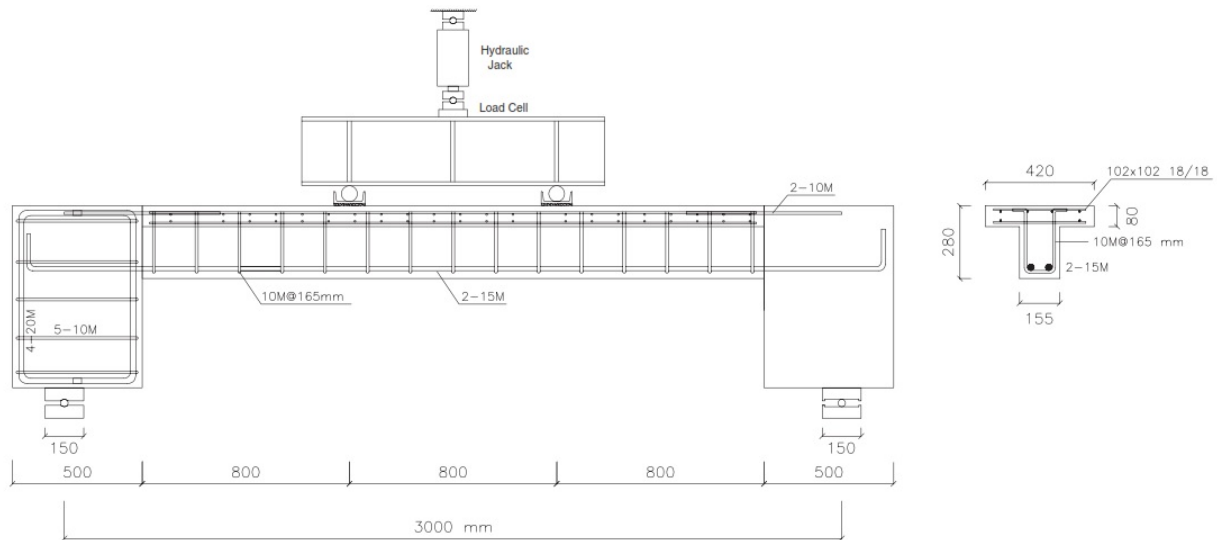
Dimensions and Details of Reinforcement of the Four Tested Beams (Galal and Mofidi, 2009)
